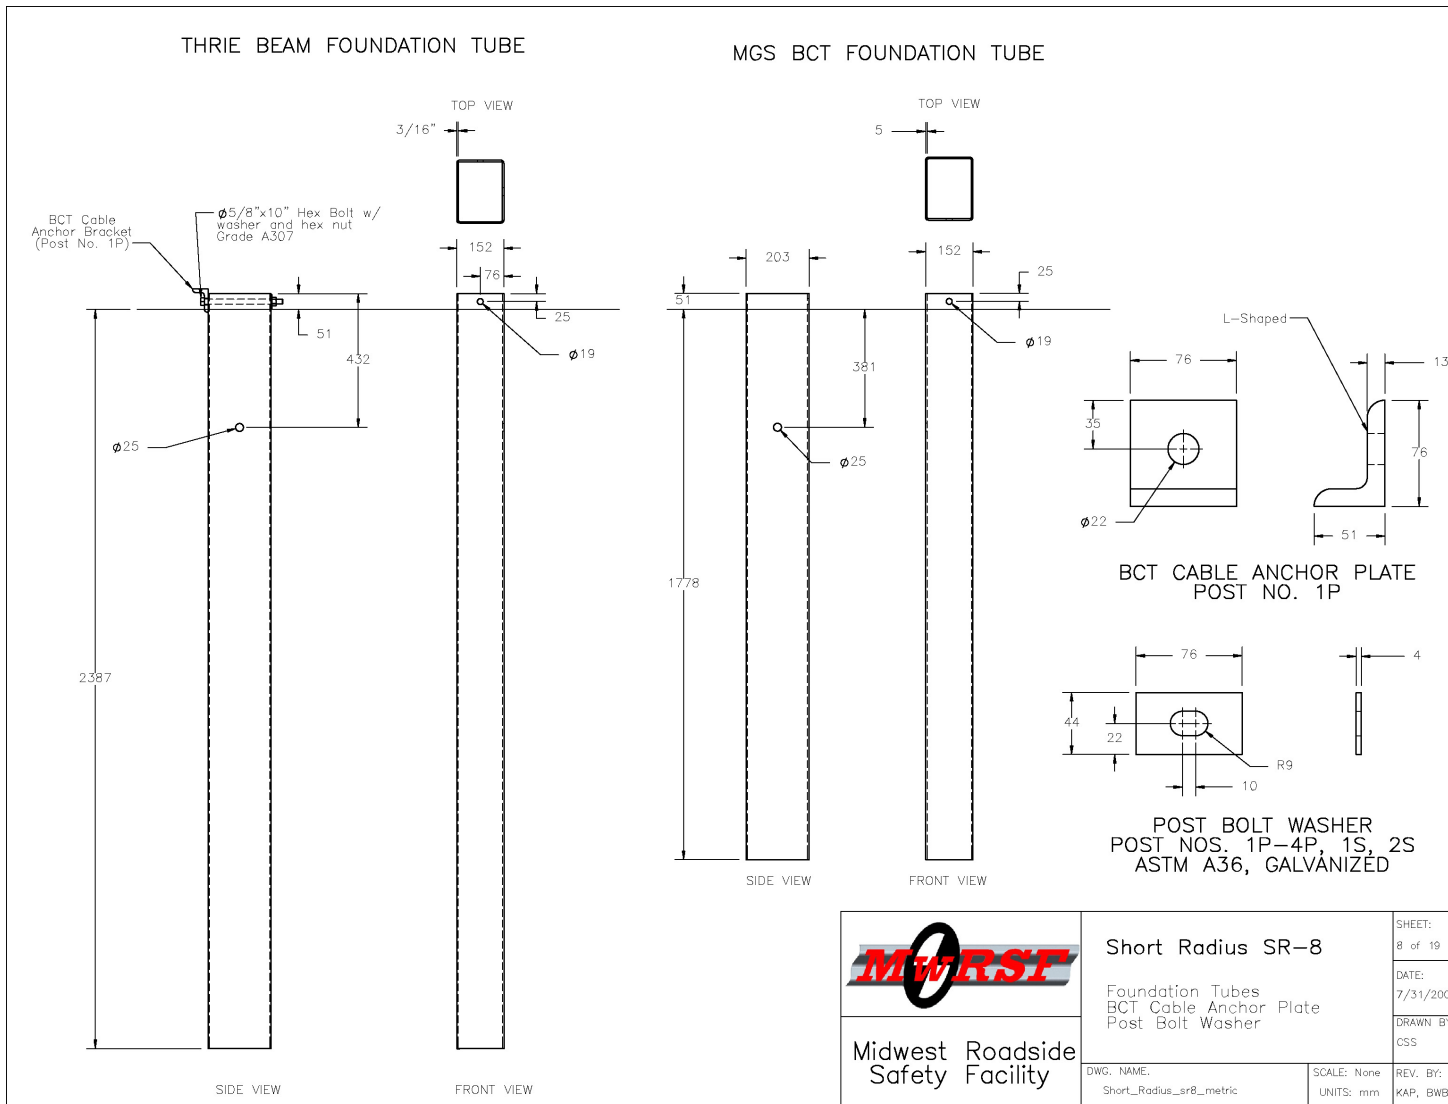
Foundation Tubes, BCT Cable Anchor Plate, and Post Bolt Washer Details
